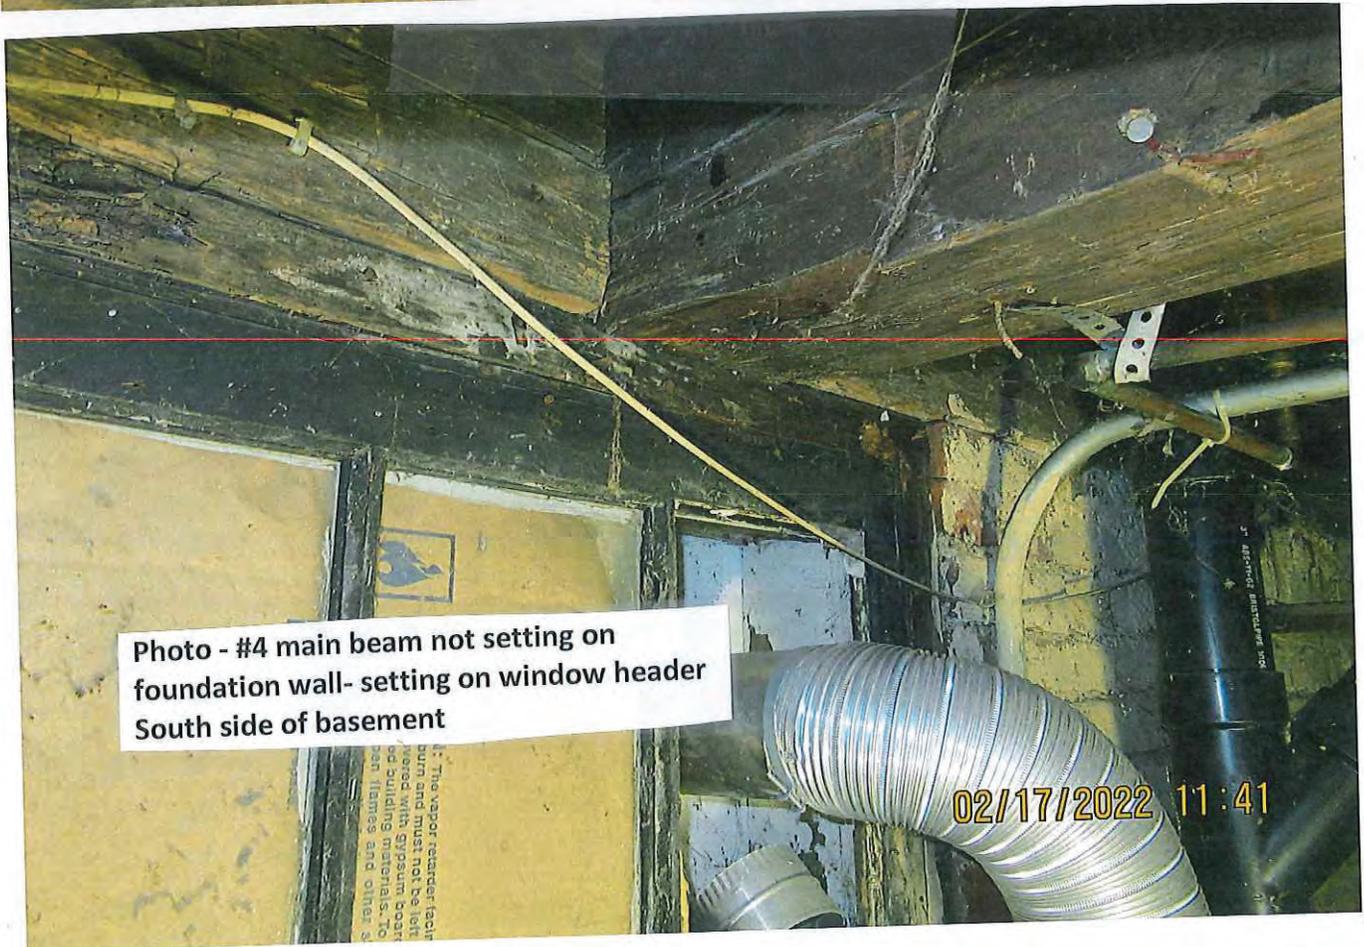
main beam not setting on foundation wall- setting on window header South side of basement
